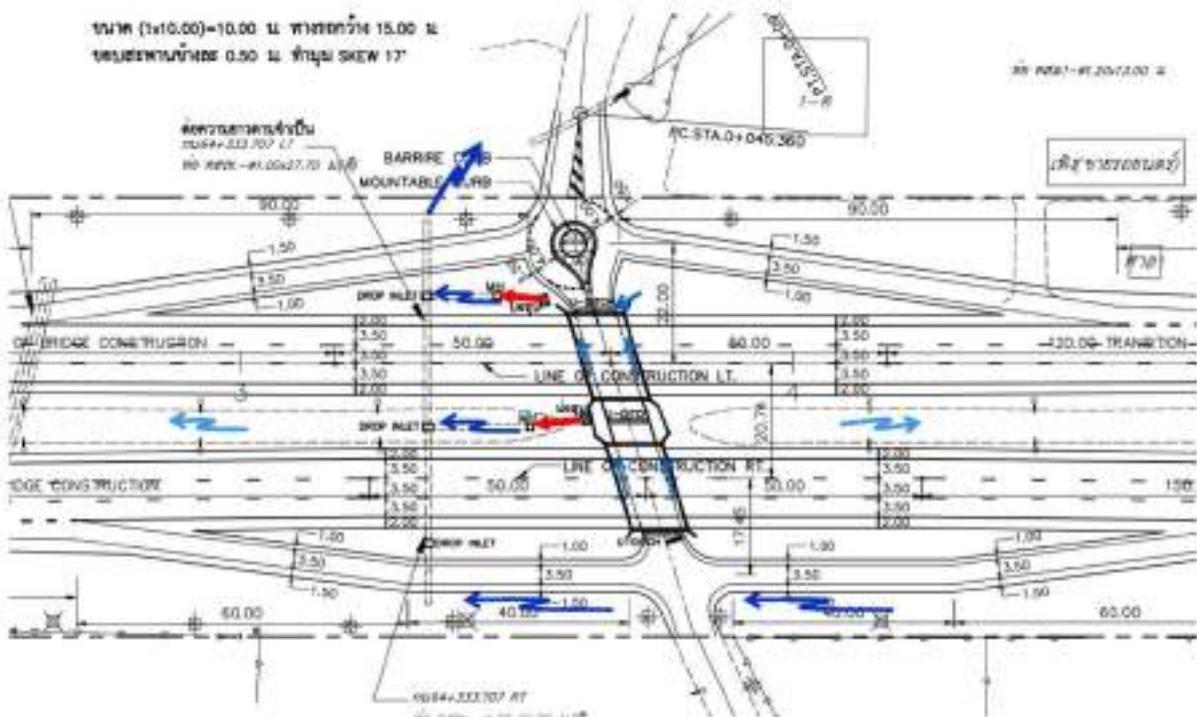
(Cont.) The construction plan and traffic patterns, including drainage, at the Po Koi intersection area
